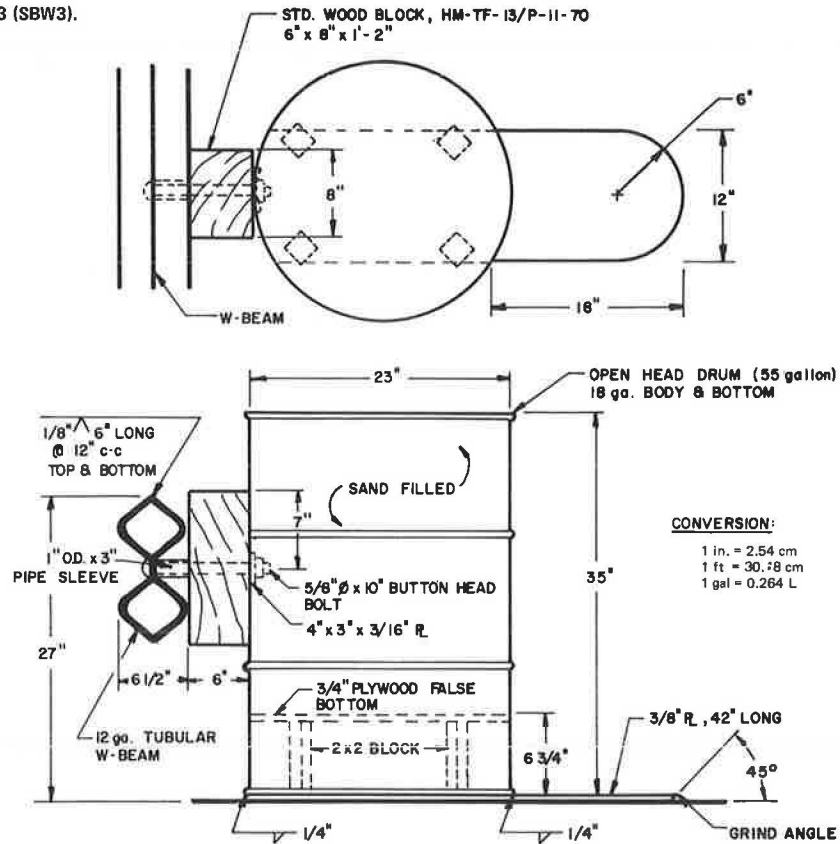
Stabilized barrel/W-section 3 (SBW3).
